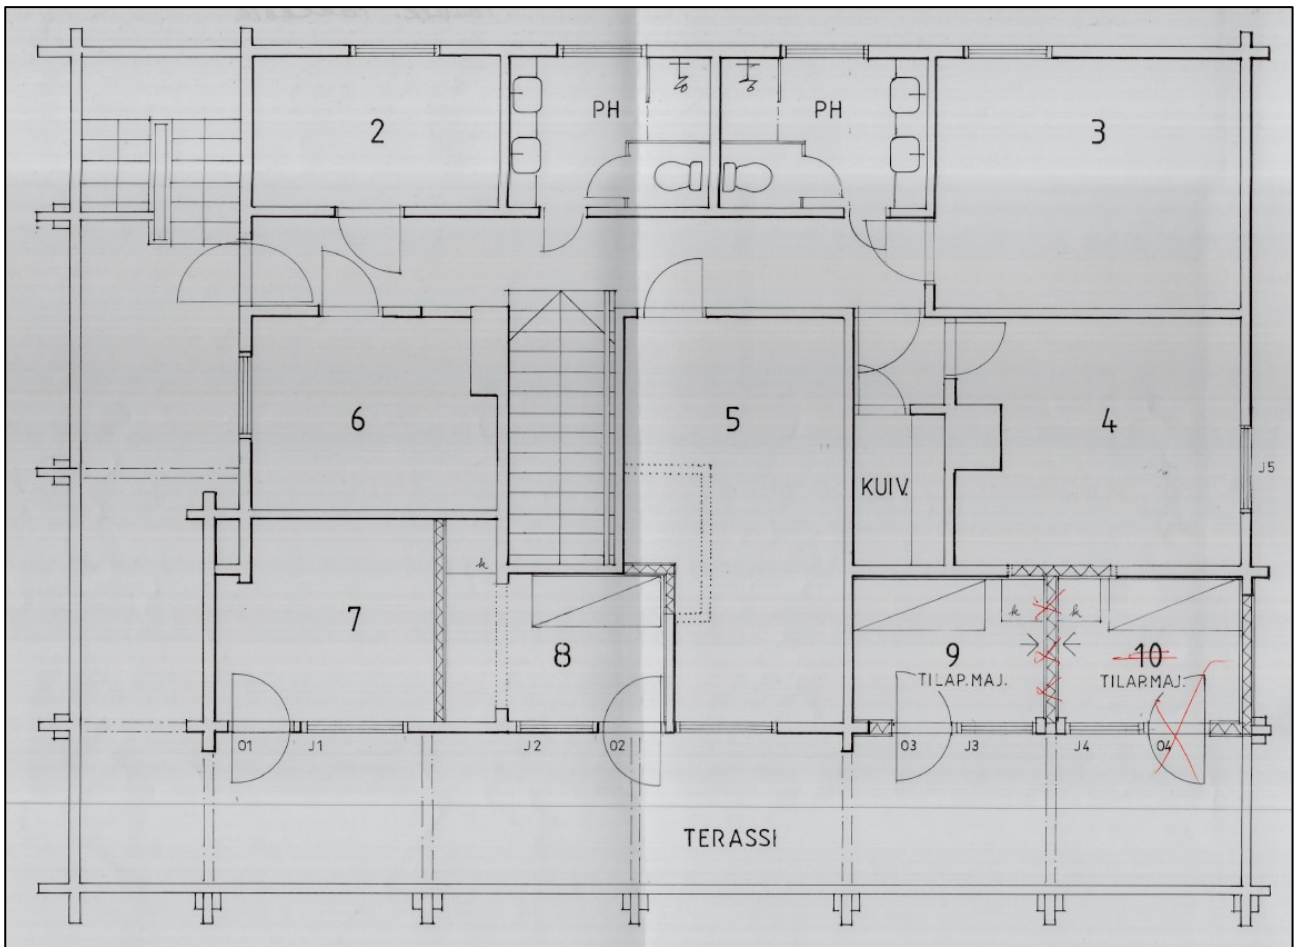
First floor in drawings of the building permit issued in 1974. (Image: Kolari building control services)
